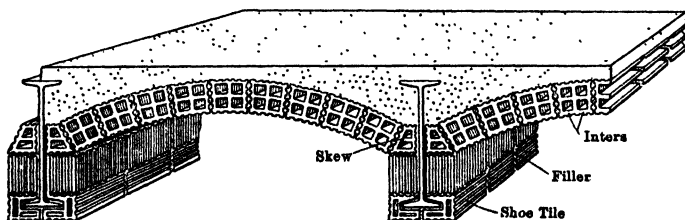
Segmental Floor-arch, Illustrating Method of Protecting Deep Girders, Concrete Fill and Concrete Floor
